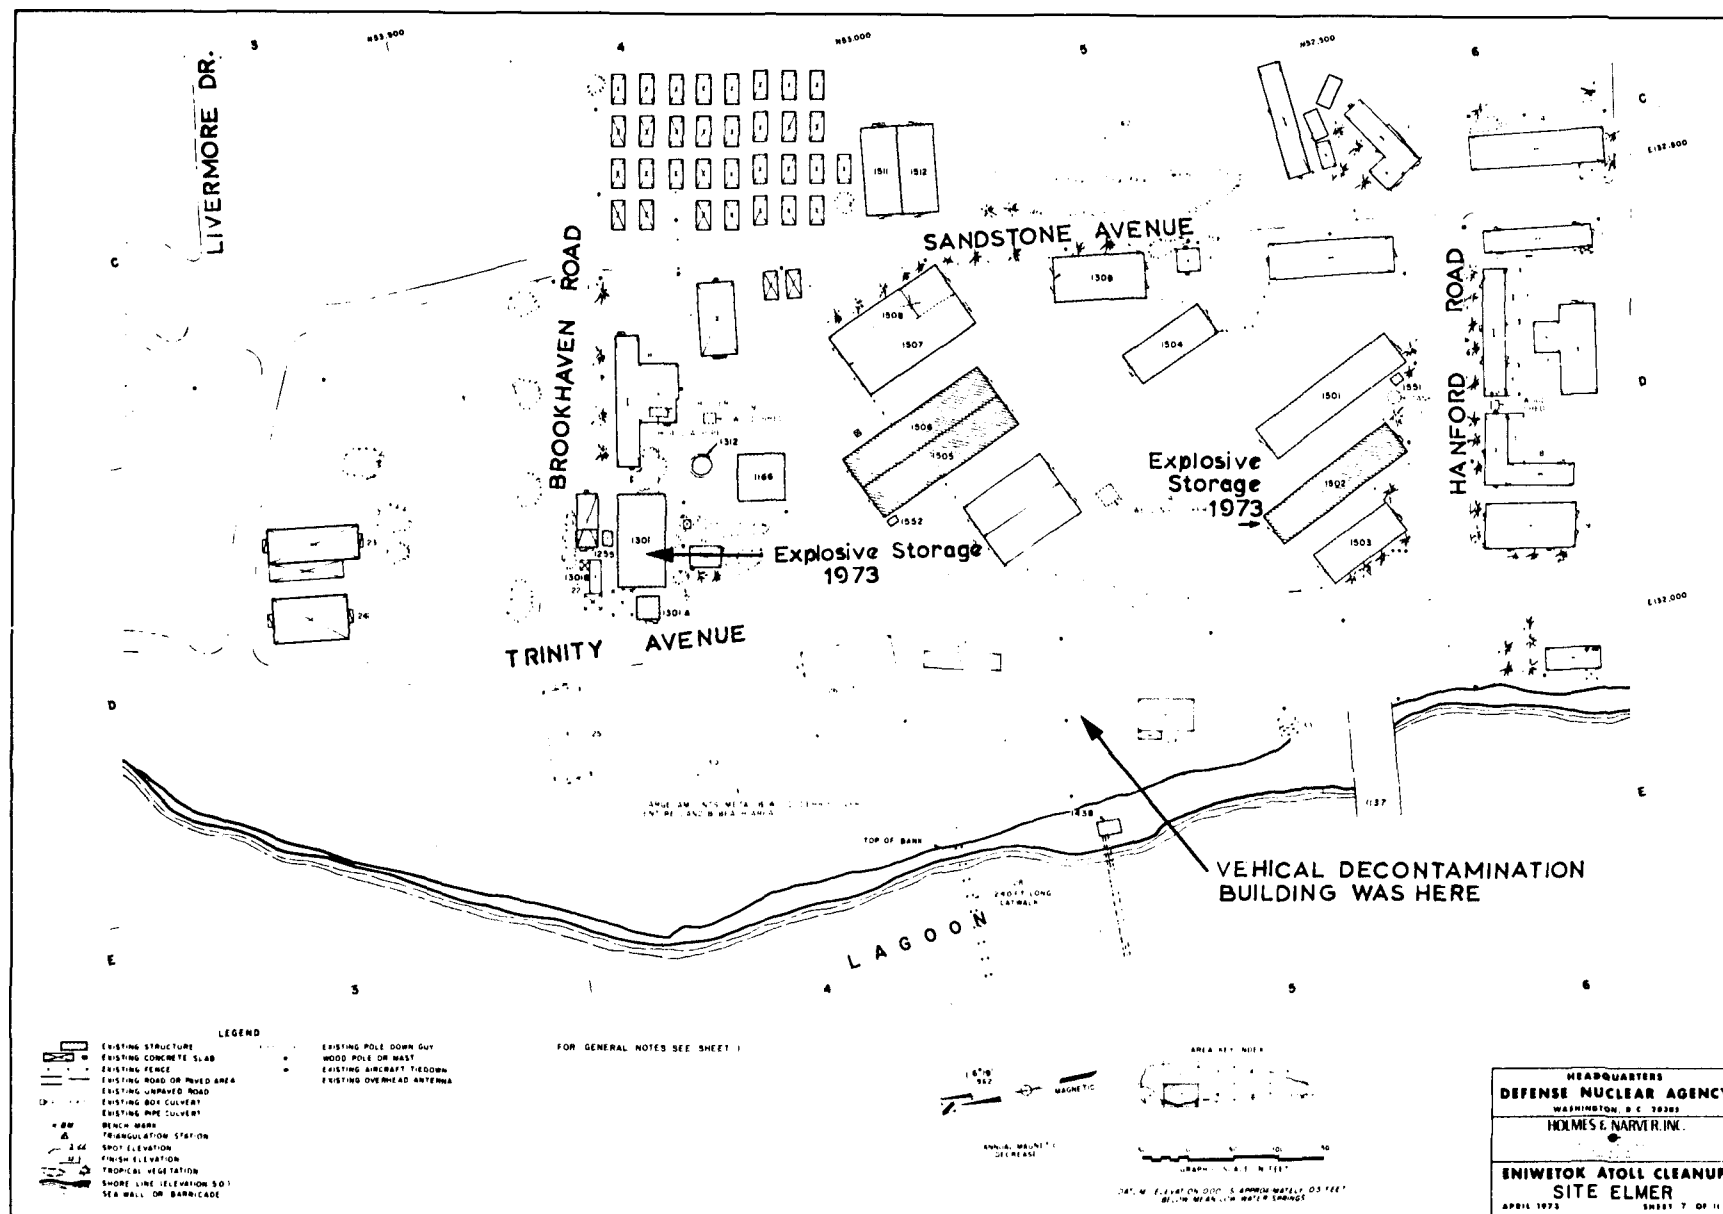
SITE ELMER, SHEET 7 OF 11
